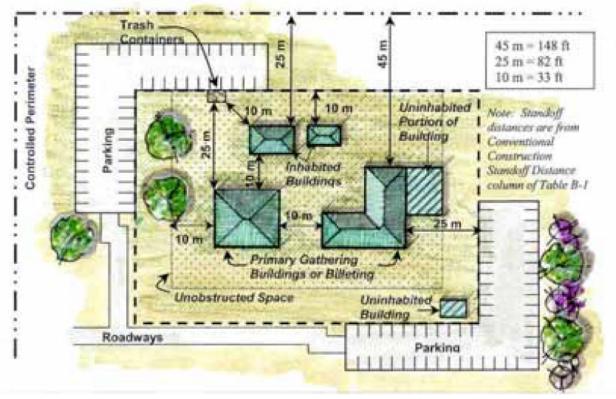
Standoff Distances and Building Separation – Controlled Perimeter
